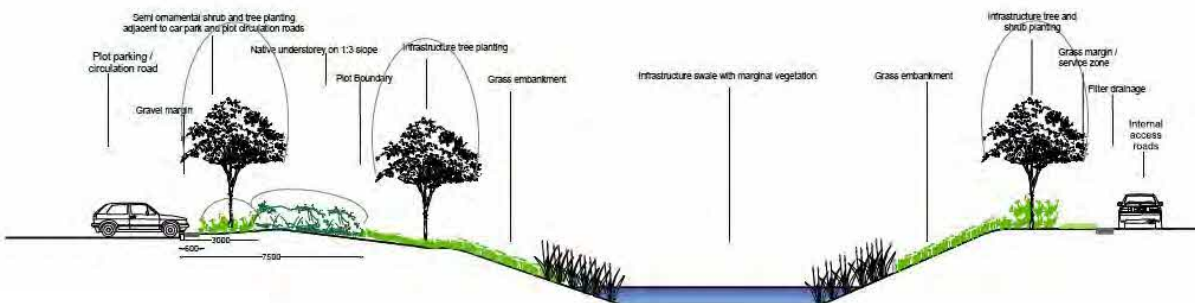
A: Landscaping where plot parking/plot circulation road adjacent to an infrastructure corridor with a secondary single access road (5m width)
